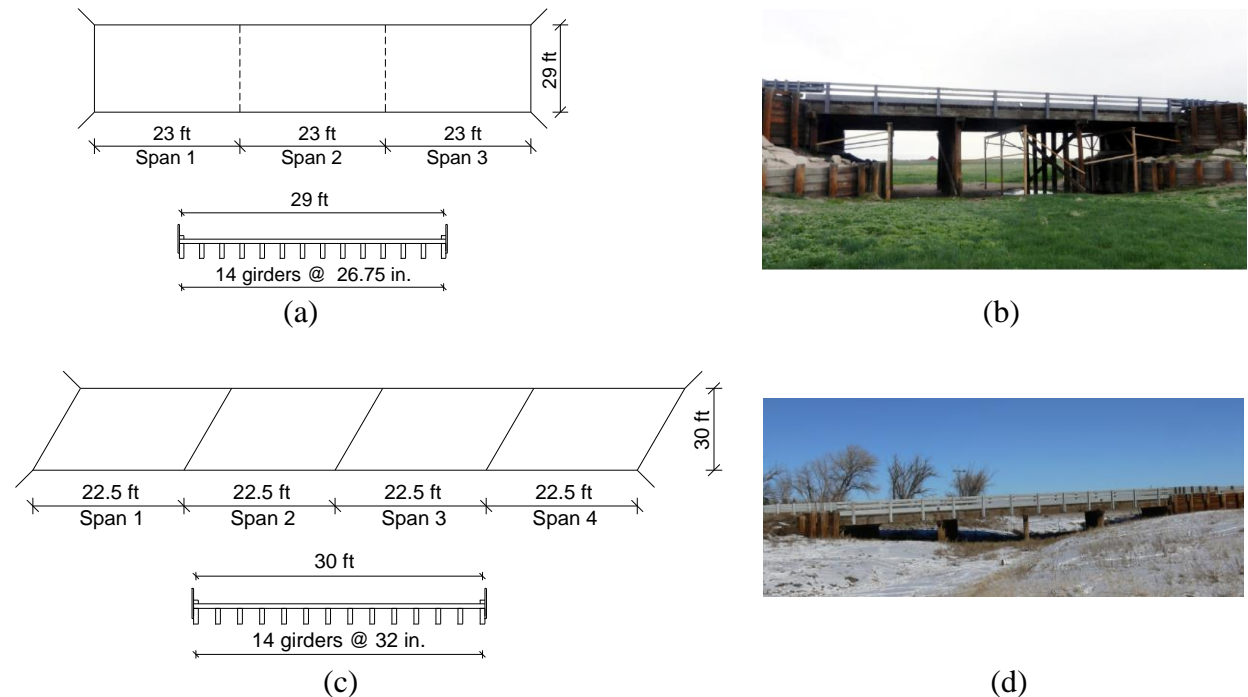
Constructed timber bridges in Colorado, USA: (a) dimension of F-22-V; (b) site view of F-22-V; (c) dimension of H-20-T; (d) site view of H-20-T
